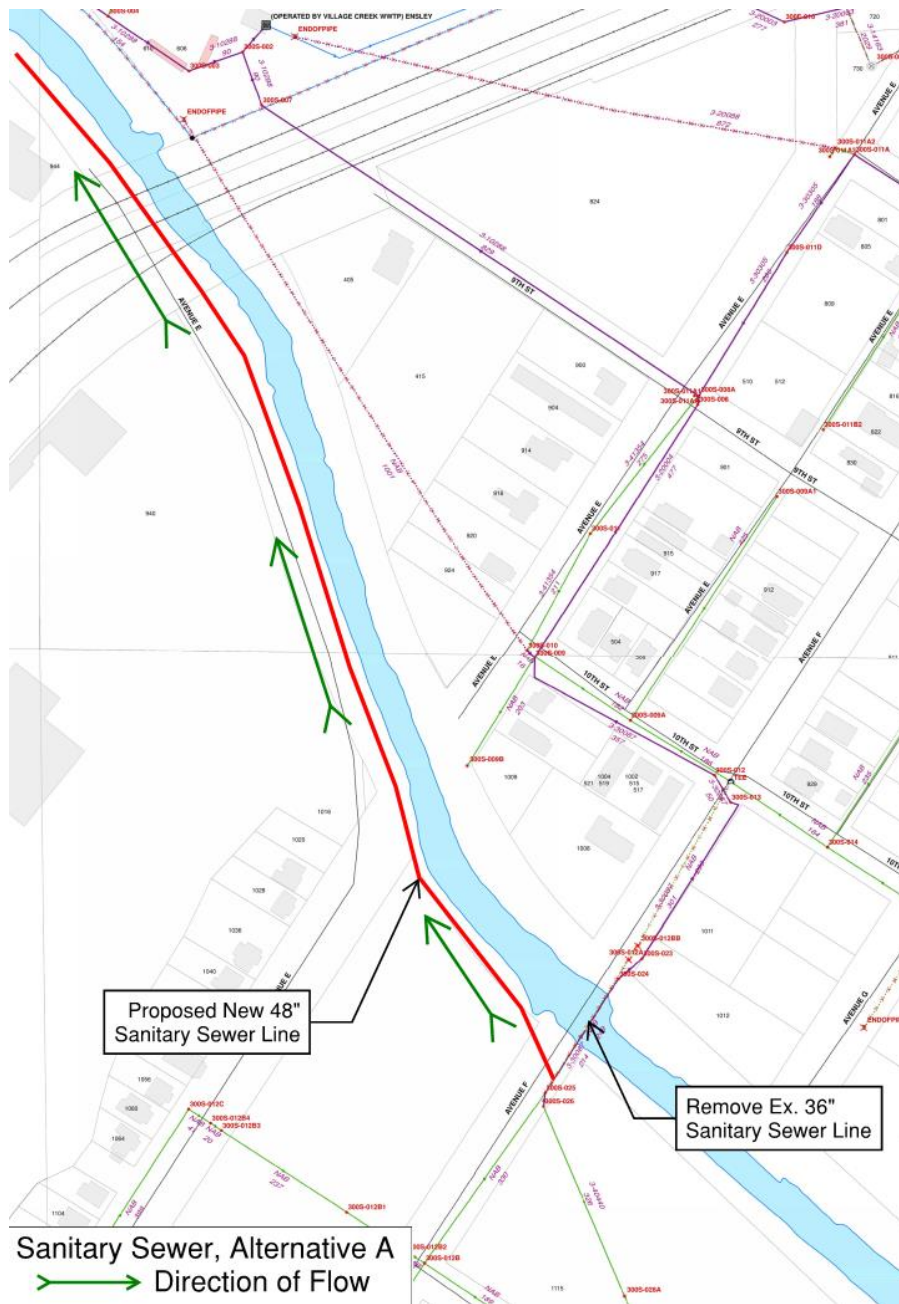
Proposed Sanitary Sewer Alternative A; Also see Exhibits for plan and profile of Alternative A.
